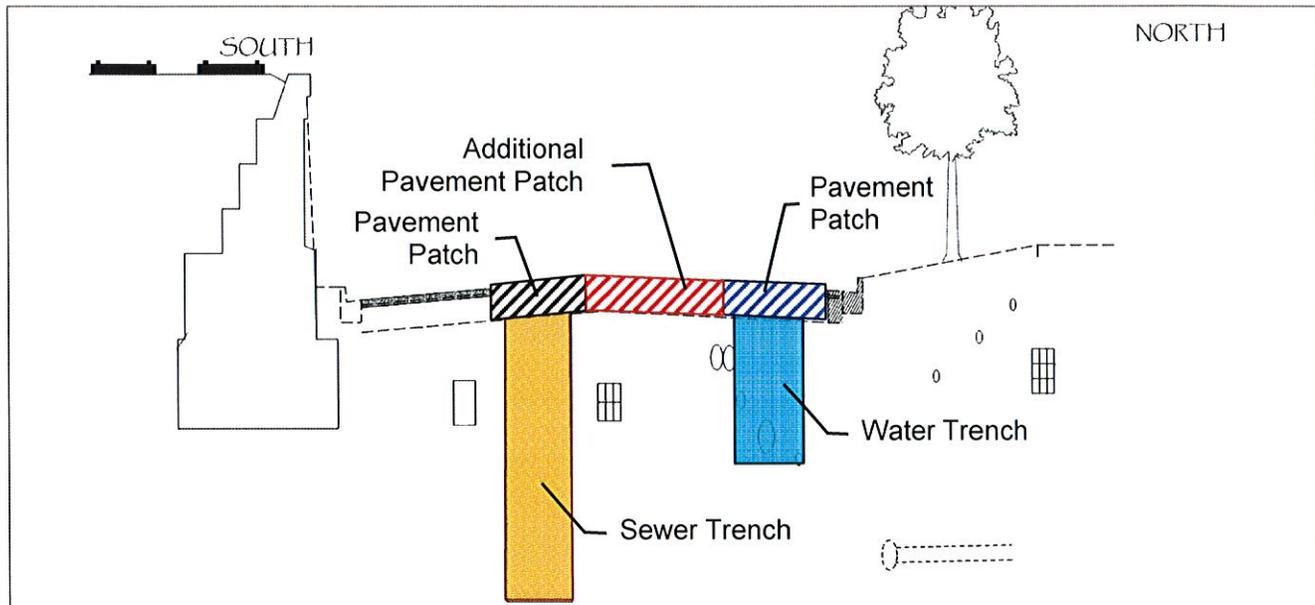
North Boulevard Improvements. With the addition of the watermain replacement the pavement of North Blvd, V3 recommends budgeting for the additional pavement patch between the water and sewer trenches as shown above.
